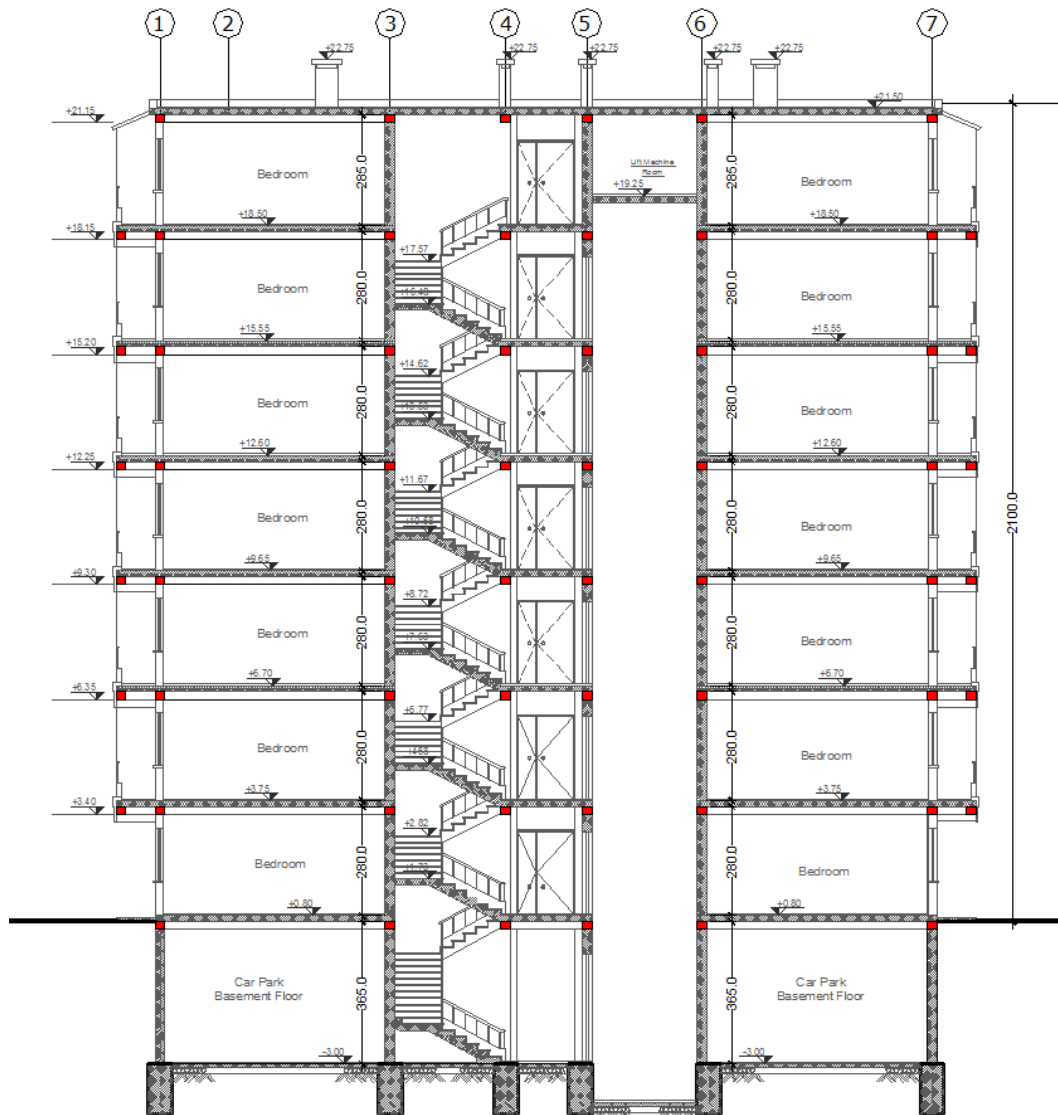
Section cutting through the building, showing the distribution of steel columns, beams as well as the central core shear wall
